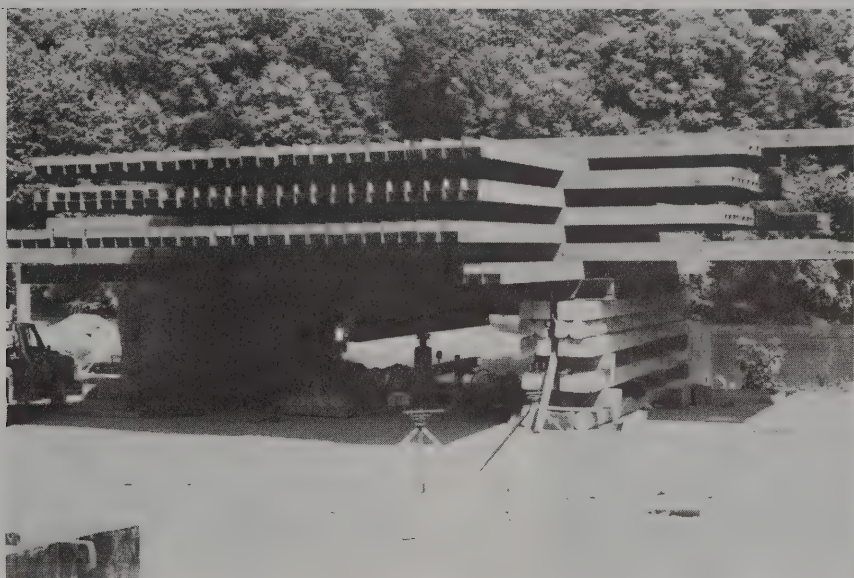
were made on completion of second CRP test, July 23, 1973. Photographs 8-13 were made on completion of first CRP test, except for No. 11 made during holding period when maximum test load was on pile.
